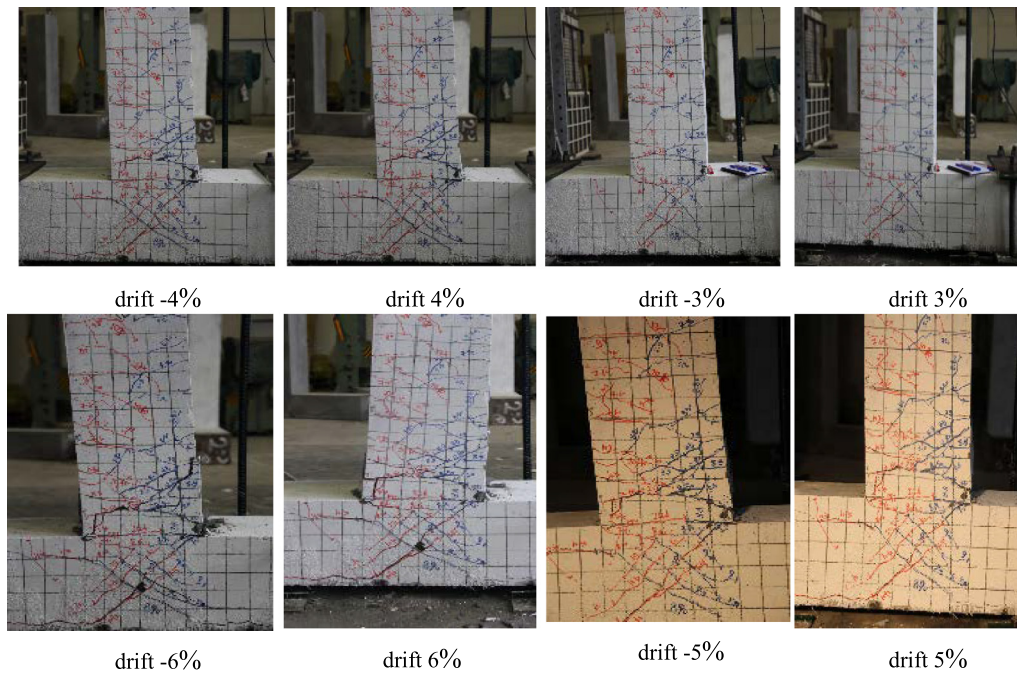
Crack propagation under loading in the specimen JH4-SCC.
